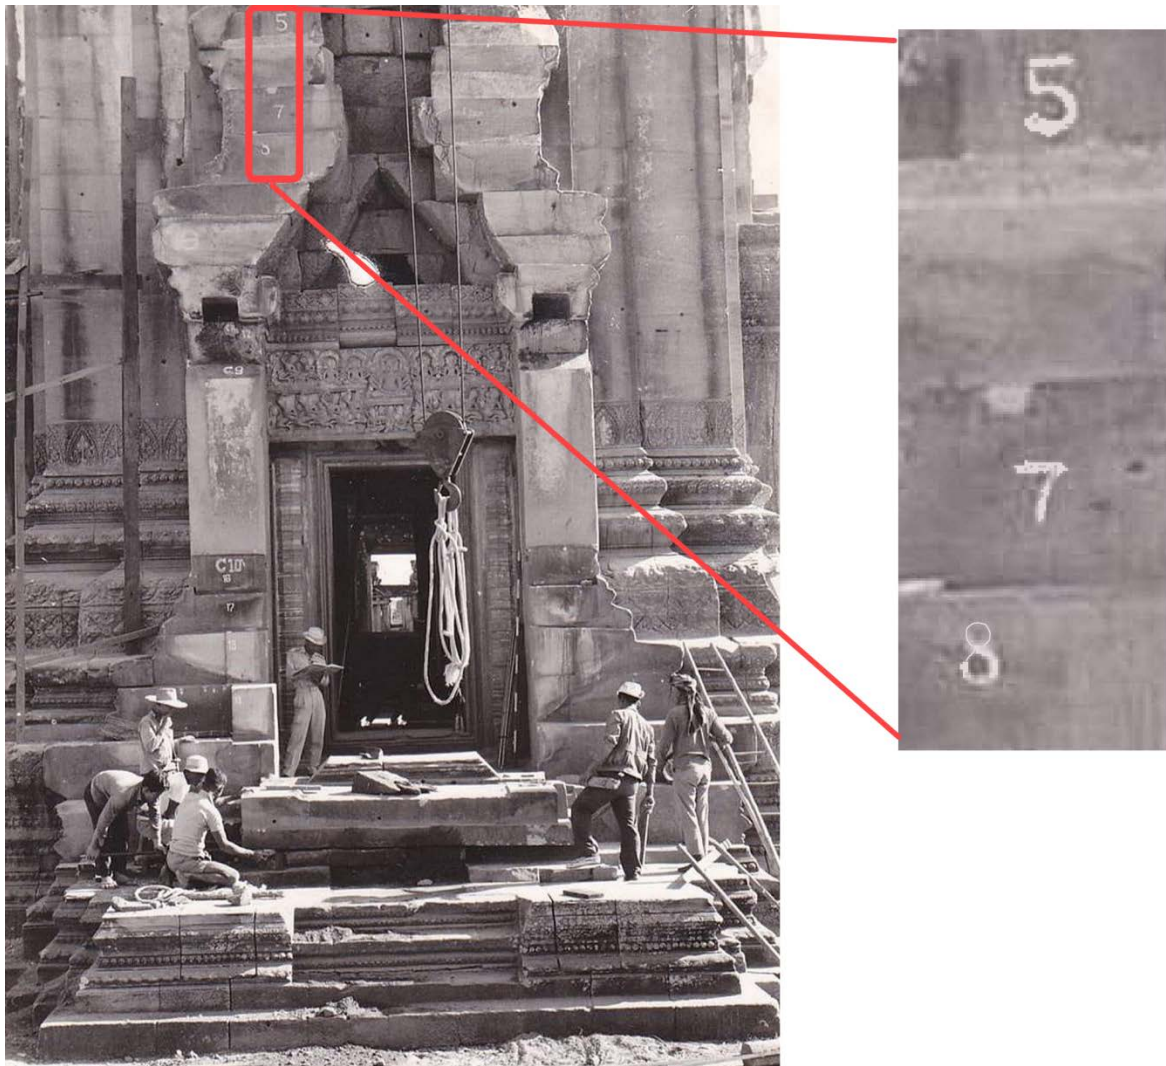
Anastylis technique - reassembly based on the coding marked on the specimens.
